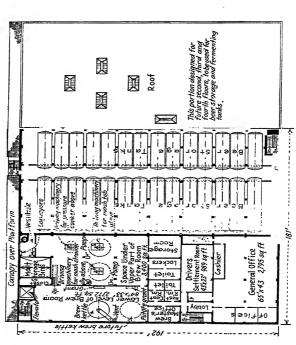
Ground floor plan of a brewery. (Vidor Buhr, Food Ind., 5, 123ff., 1933.)
